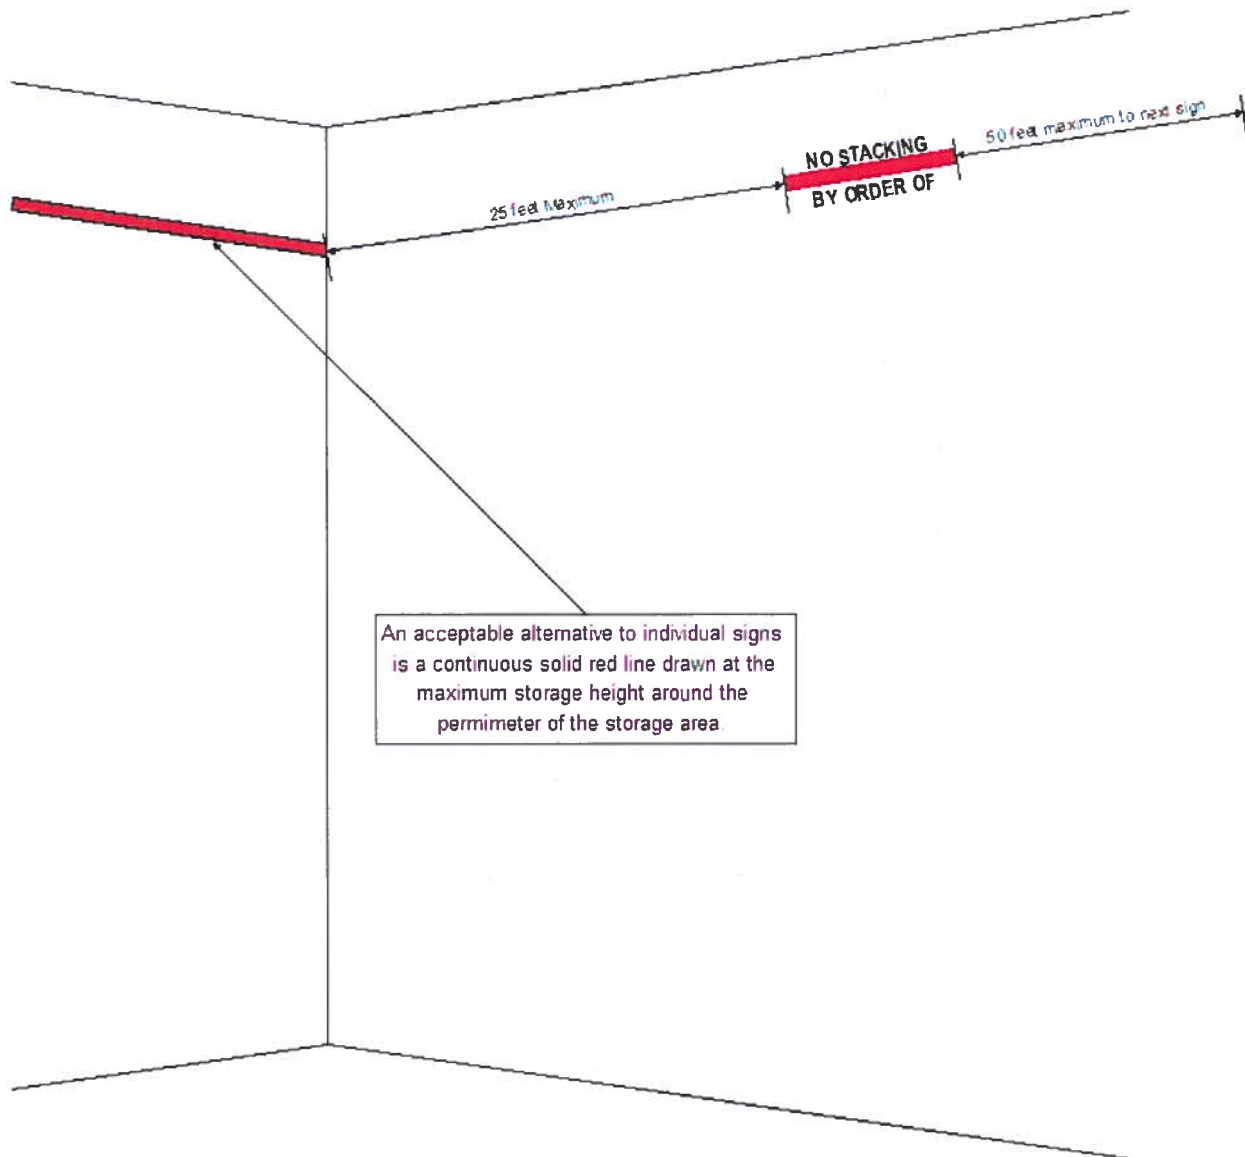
ISOMETRIC CORNER EXAMPLE FOR MARKING INSTALLATION
